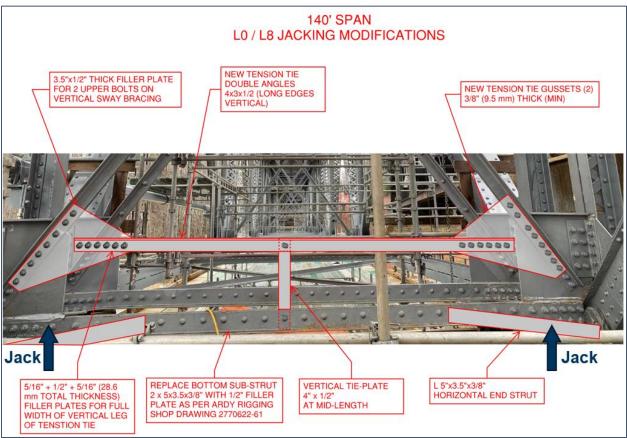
Additional Bracing Installed During Construction to Prevent Jacking Deformations
